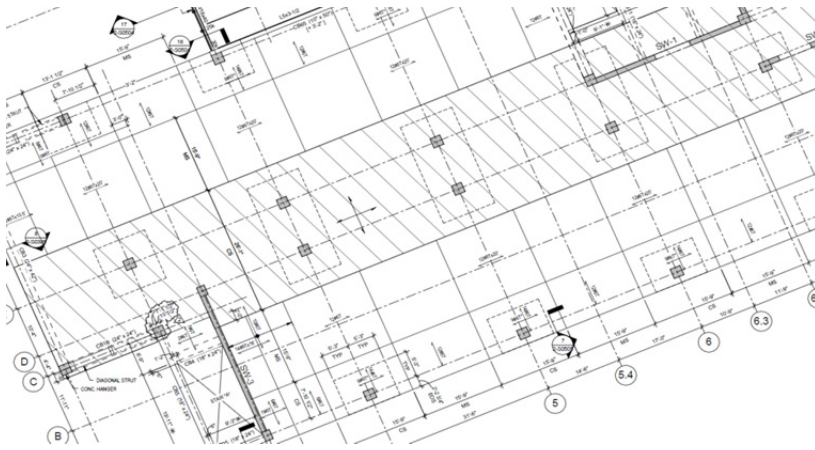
TYPICAL FRAMING PLAN SHOWING BEAM CB2
